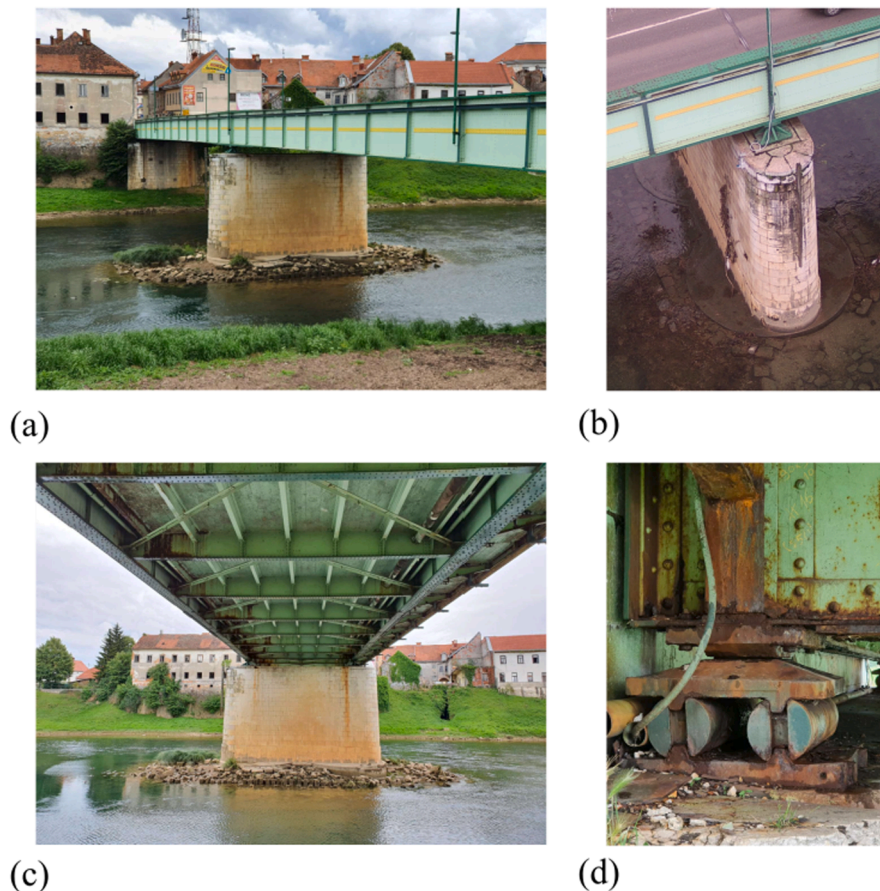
Overview of the bridge geometry: (a) Side view, (b) Detail of the middle pier and well foundations, (c) View below the bridge deck, (d) Detail of the roller bearing at the abutment.
